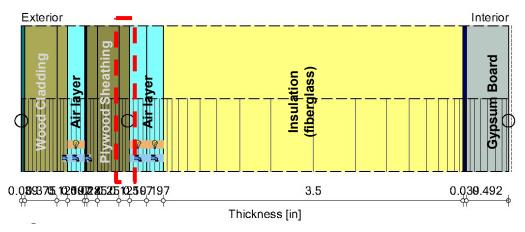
WUFI cross section (Round 1, Wall 1) showing sheathing MC of the interior layer
